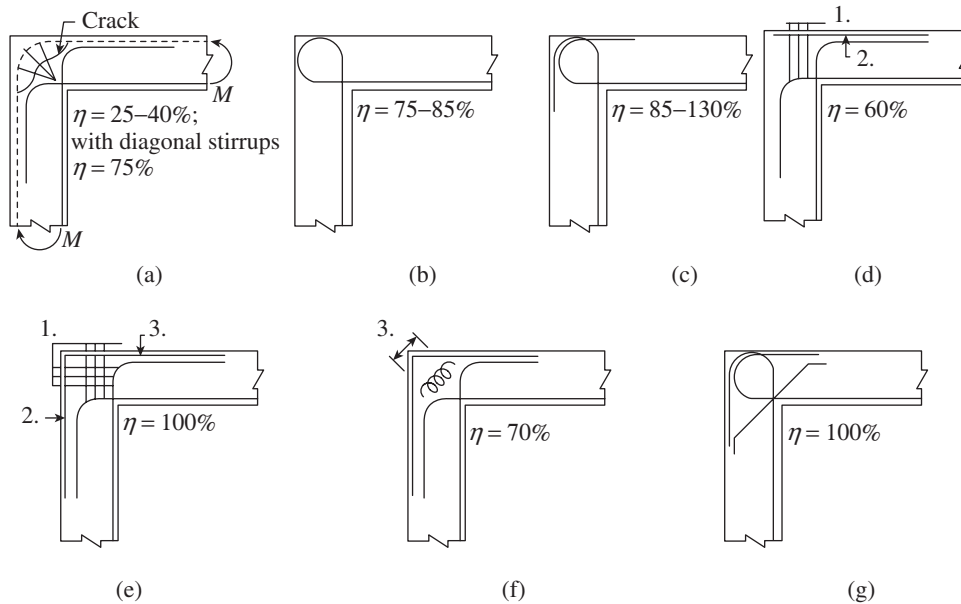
Measured efficiency of opening joints (a) Detail A—Simple detail (b) Detail B—Loop detail (c) Detail C—Two U hooks (d) Detail D—Vertical stirrups (e) Detail E—Simple detail (f) Detail F—Cross-diagonal spiral (g) Detail G—With diagonal bar
